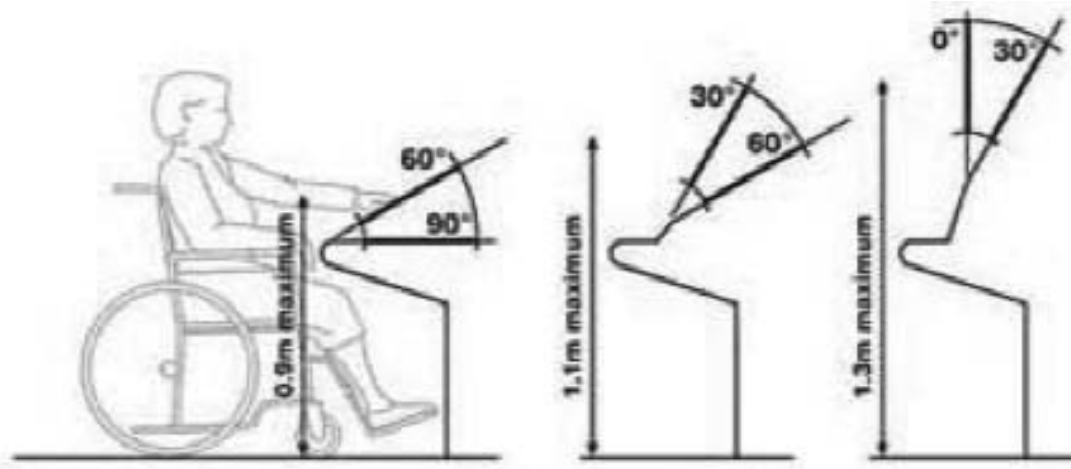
Furnishings can be modified to add access and reduce glare.
